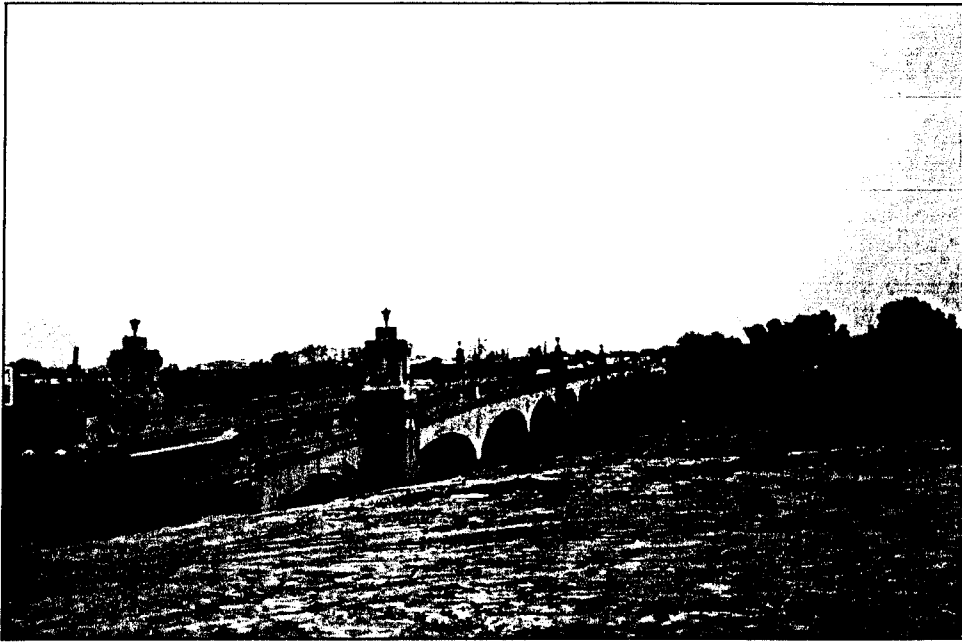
View southeast of Seventh Street Bridge with SPRR Bridge to left.
